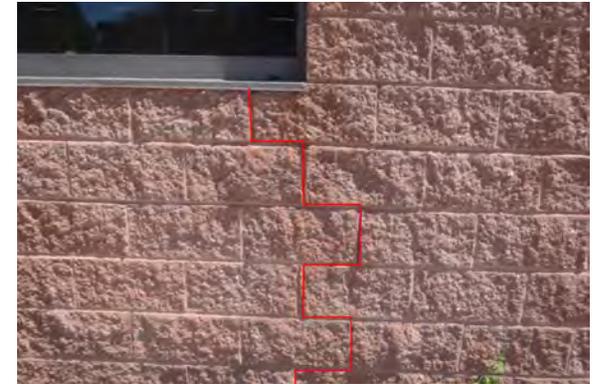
Cracking below window frame corner at southwest elevation
